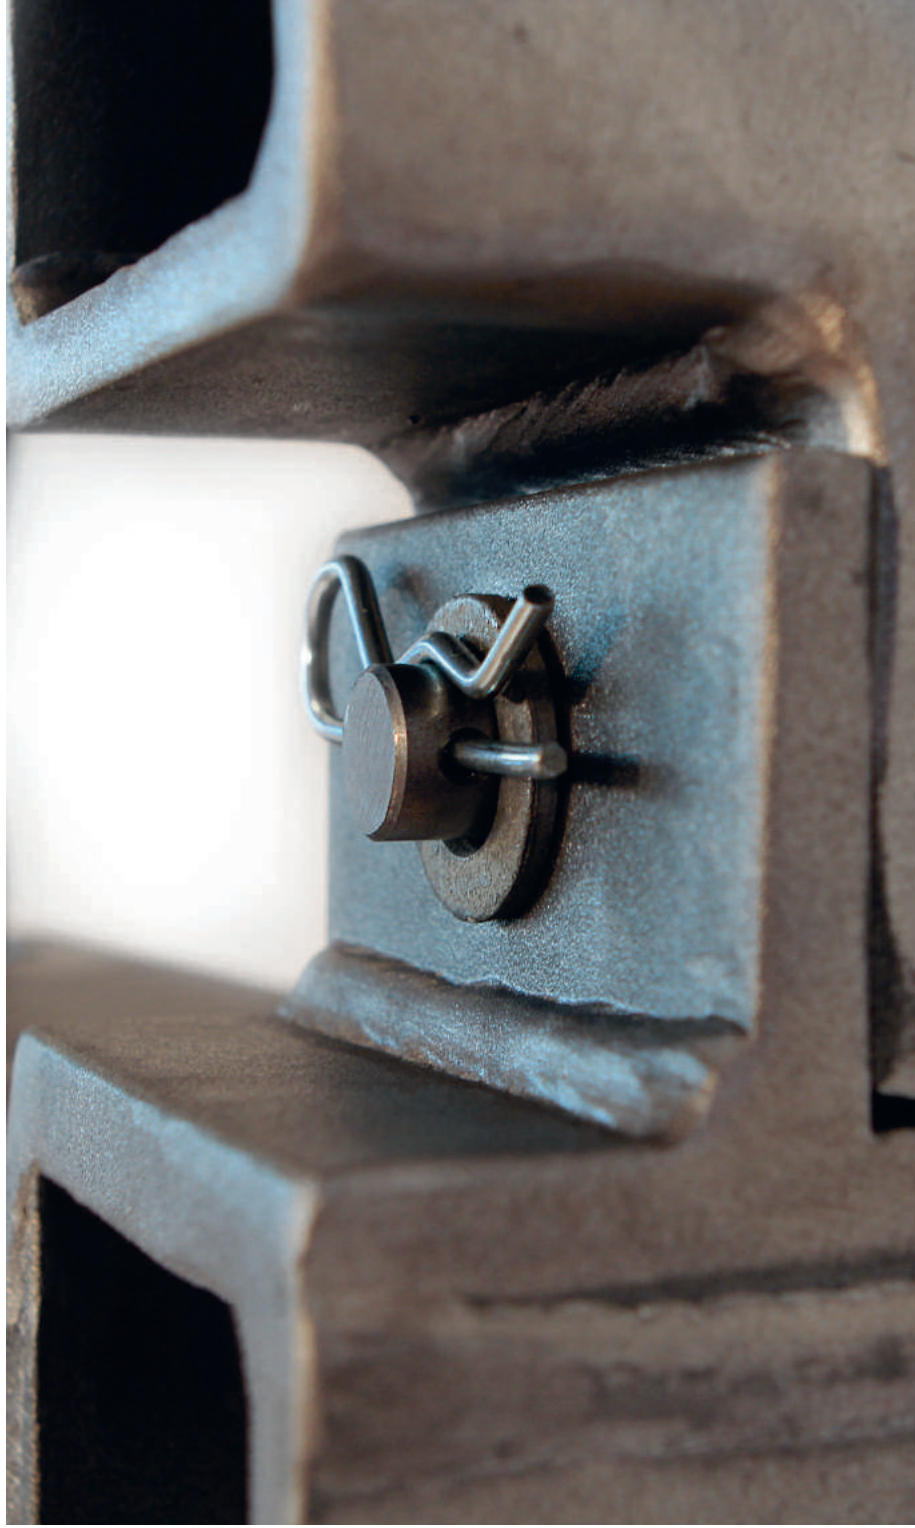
Vertical view of a wall — slab construction designed for disassembly.
